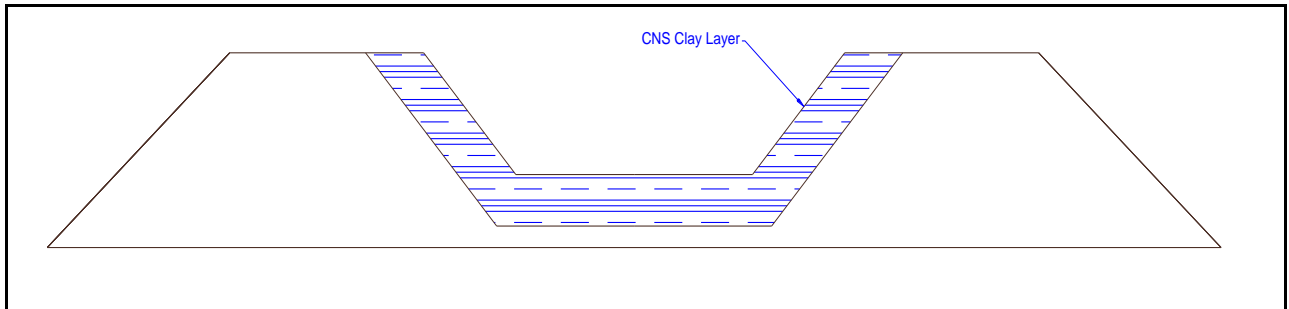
Canal section in sandy embankment with cohesive non-swelling pad
